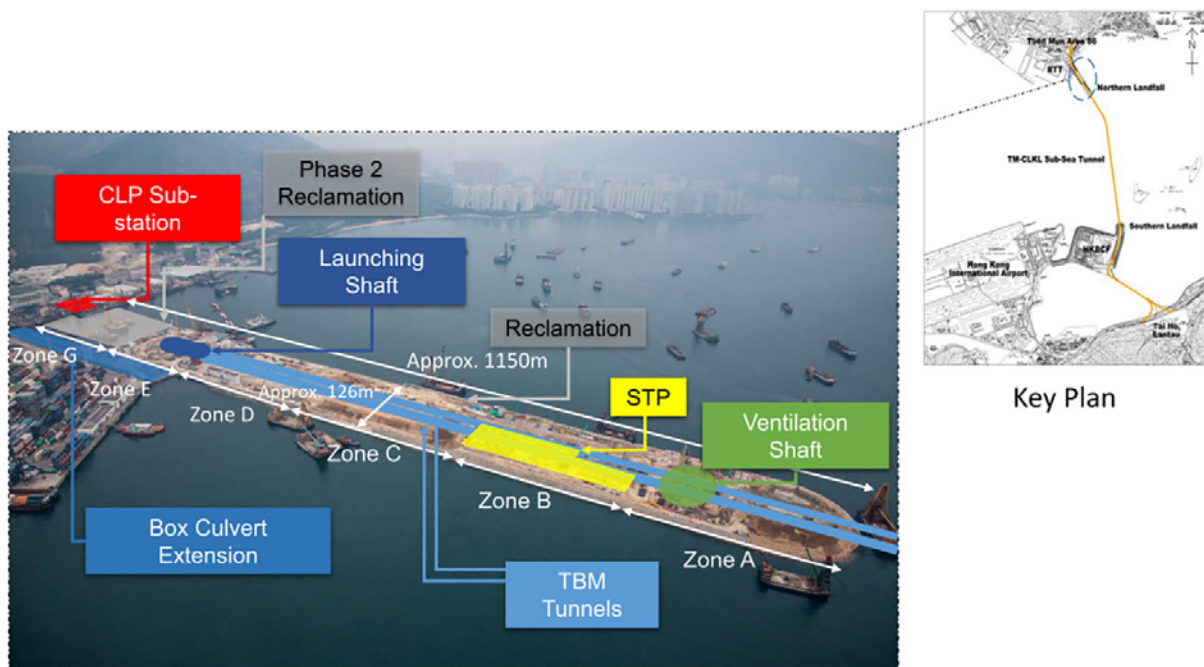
Site Location Plan and Major Facilities at Northern Landfall
